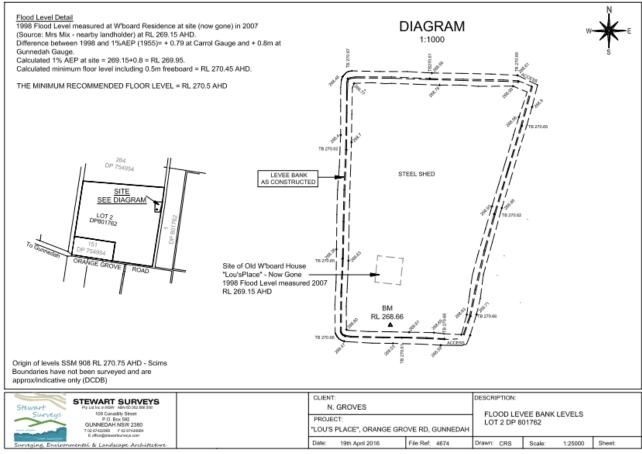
Construction details for ring levee at 765 Orange Grove Road (Myalla, or "Lou's Place")
